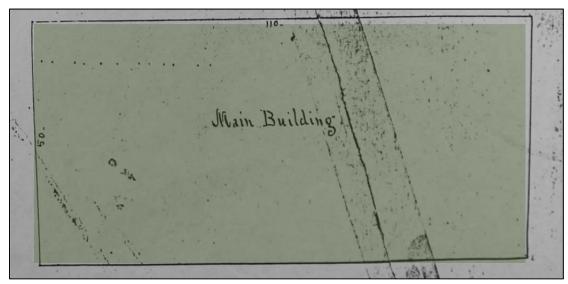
1847 Mount Vernon Cotton Factory, original footprint of building highlighted in green. C.S. Hallowell Map. Courtesy of Alexandria Local History Special Collections.
